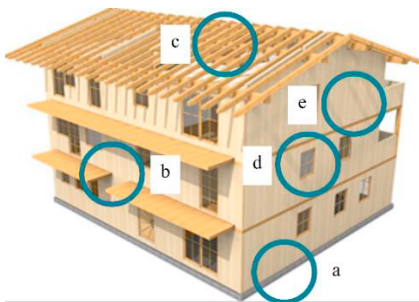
(a) wall-foundation connection; (b) balcony; (c) roof; (d) window/door detail; (e) wall and floor.
